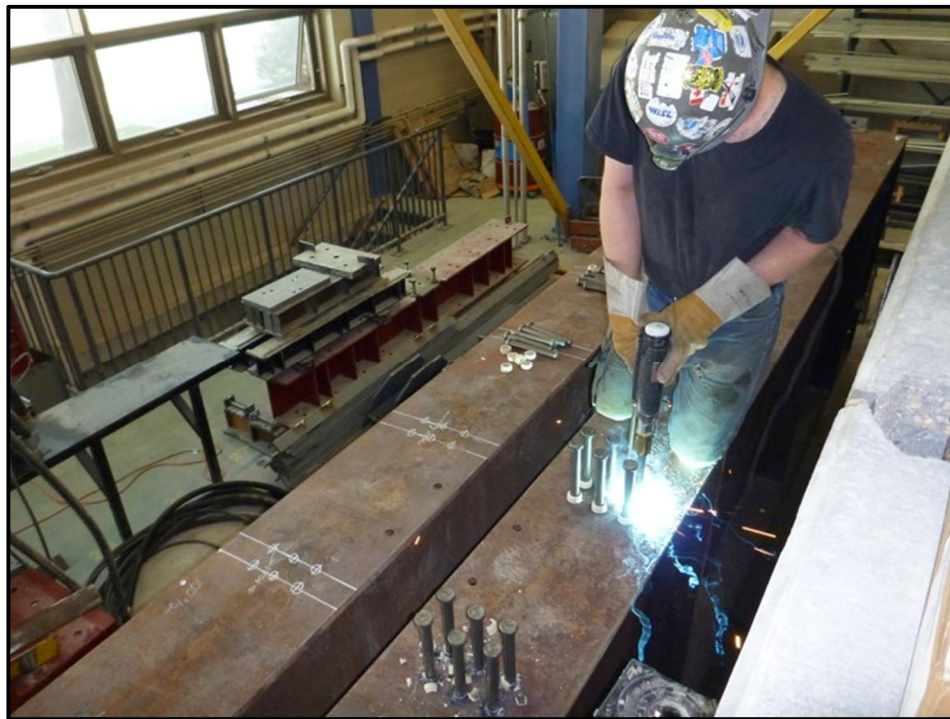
Shear Studs Installed on Girders Using Shear Stud Gun Prior to PPCP Placement (TS2)
